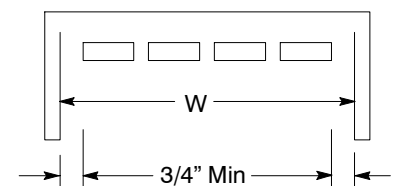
Underground Service Termination Switchboard Service Section
